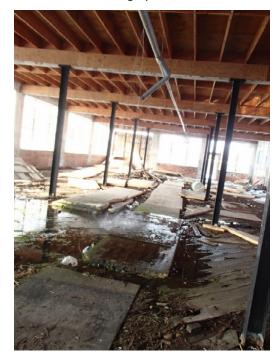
2nd Floor Level Looking up at Underside of Roof, Roof Drain Pouring into Building – Block #5
